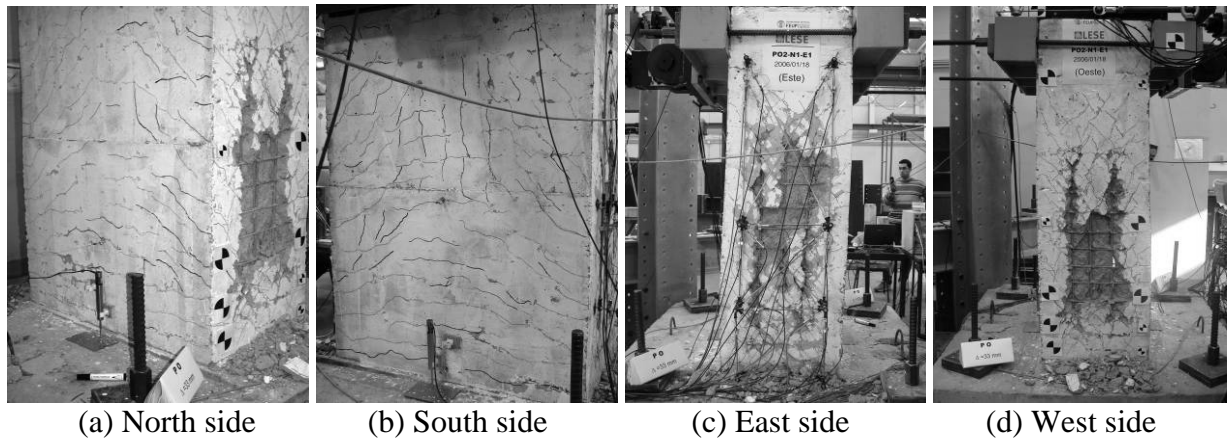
Pier PO2 damage for 2.4% drift.
